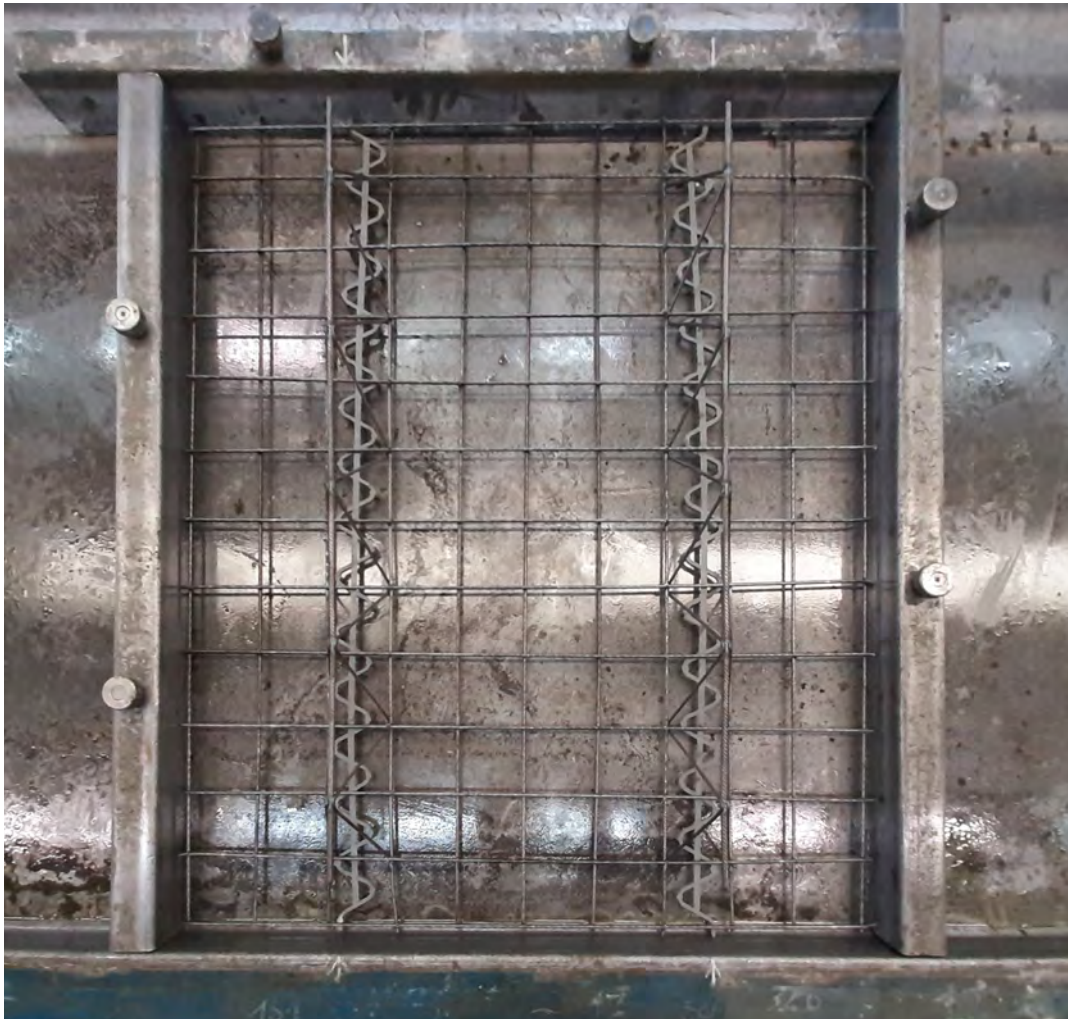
The reinforcement arrangement on the formworks of the modules type B: top view
